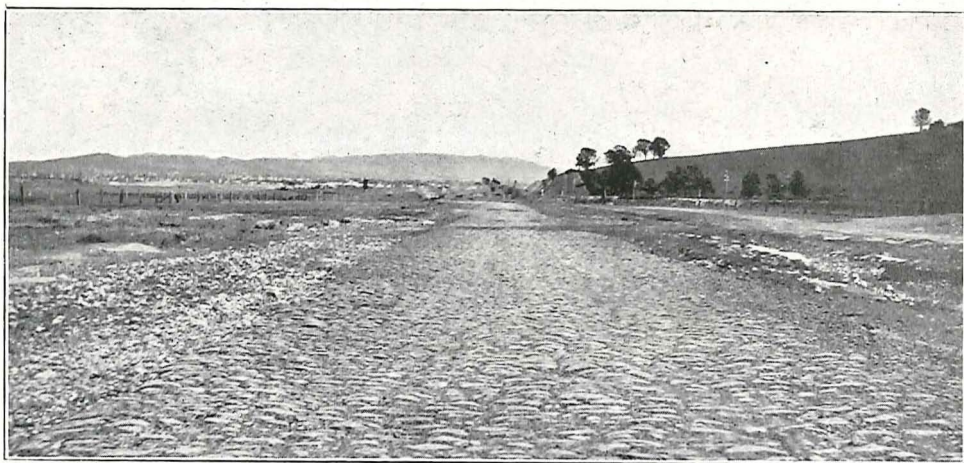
Showing neglected section, Ballarat-Stawell Road, now being re-constructed.
